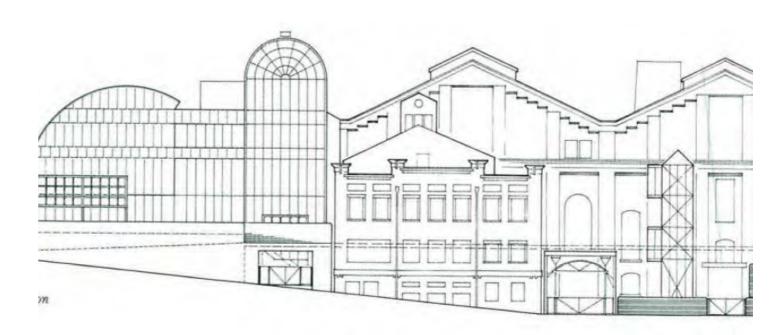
Lionel Glendenning, architectural drawing of south elevation of Stage 2 Powerhouse Museum, 1987 (Source: MAAS 2008/88/1-5)
